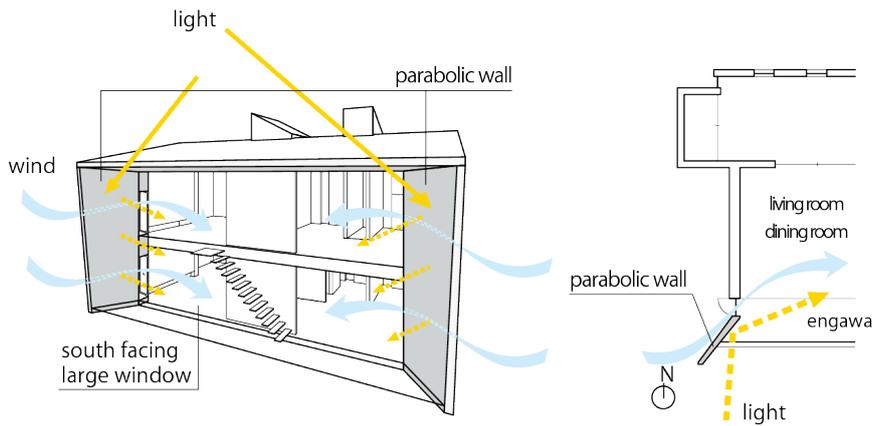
Parabolic wall, Photo.7\* Ventilation tower
